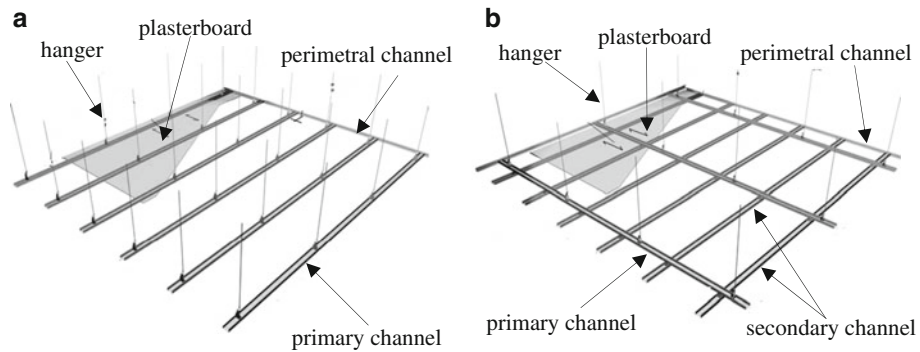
Suspended plasterboard continuous ceilings: a single frame ceiling (SFC); b double frame ceiling (DFC)
